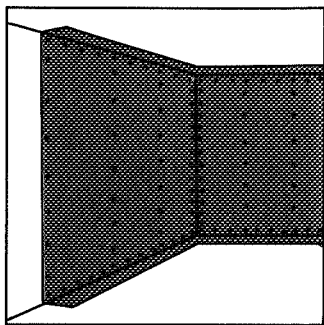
The upper floor's gables are covered in plastic foil first after which the roof is covered. In the roof, the foil is laid parallel with the roof trusses. The rolls can pass through an opening in the intermediate joist structure. The joints, with a good amount of overlap, are laid over supports and clamped with plywood strips or are taped.
